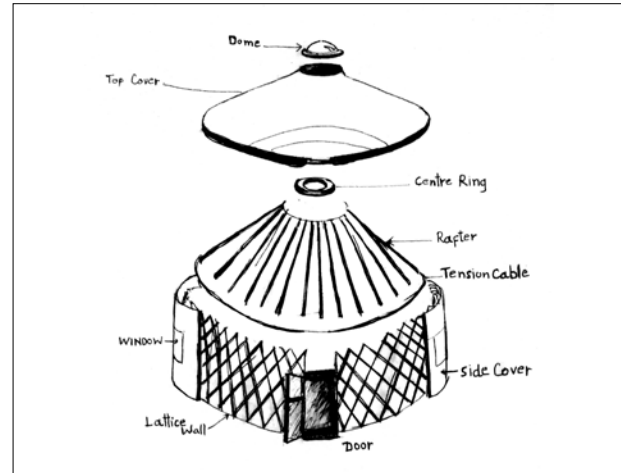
Yurt, Mongolian tent, similar in construction to wooden houses. (Drawing: Authors)
